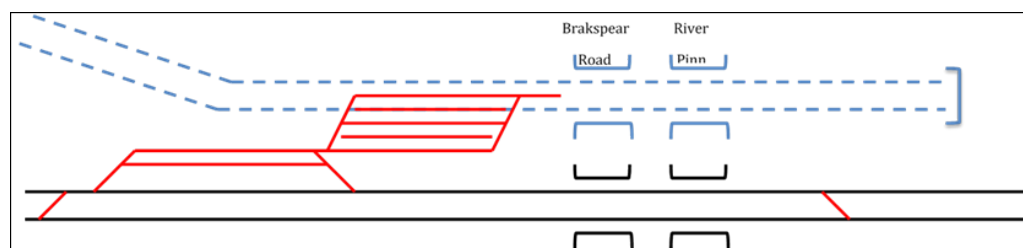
Railhead eastern rail connection west of Breakspear Road South
